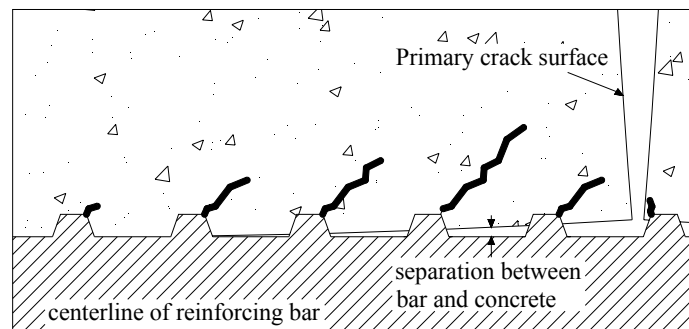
Detail of Fig. 2.10: section through reinforcing bar and concrete, showing separation that occurs near a primary crack
